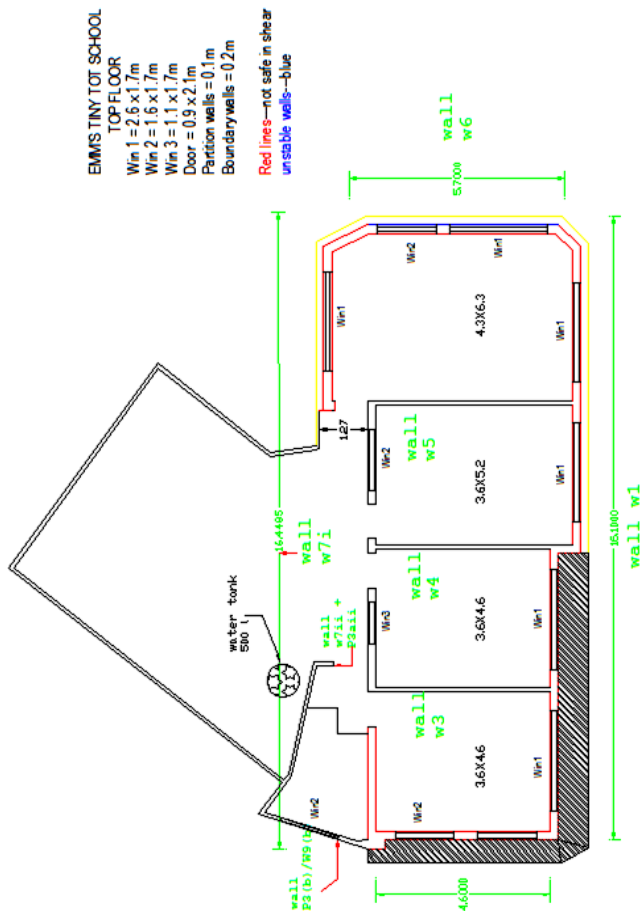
Plan of Top Floor and Unstable Walls in Blue
